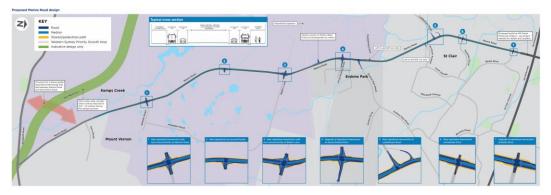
Proposed Mamre Road design Source – TfNSW, April 2020
